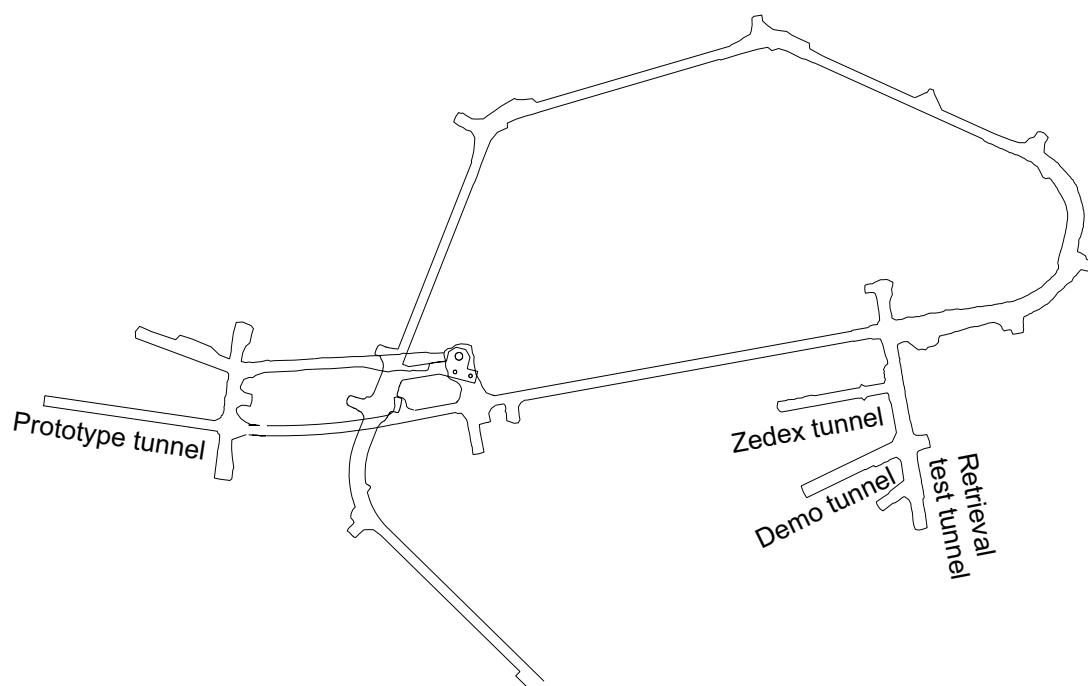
Äspö HRL tunnel layout for 420–450 m depth.
